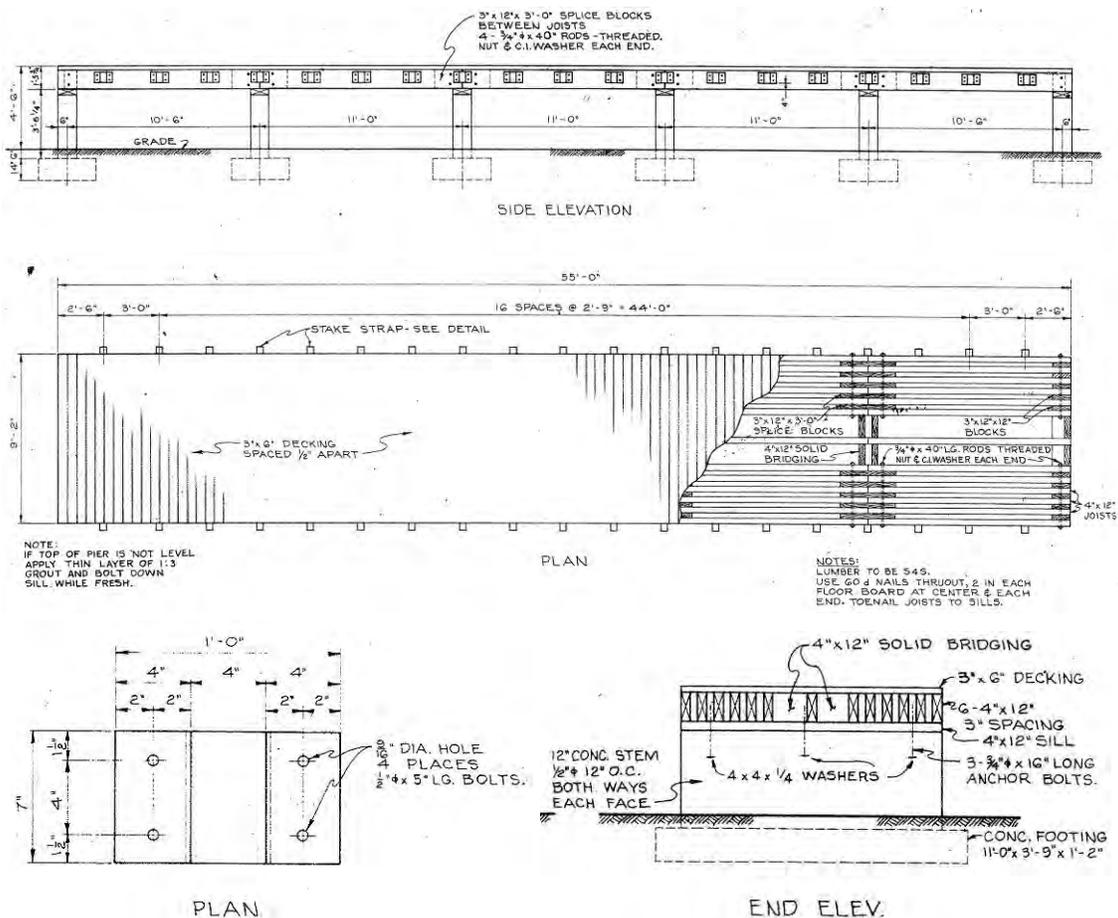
Rail movement mock-up, simulated flatcar (frame construction), Fort Bragg, NC, 1952 (standard drawing 28-13-52 sheet 1 of 4; rail movement mock-up, frame construction, plan, elevations, and details; 11 April 1952).
